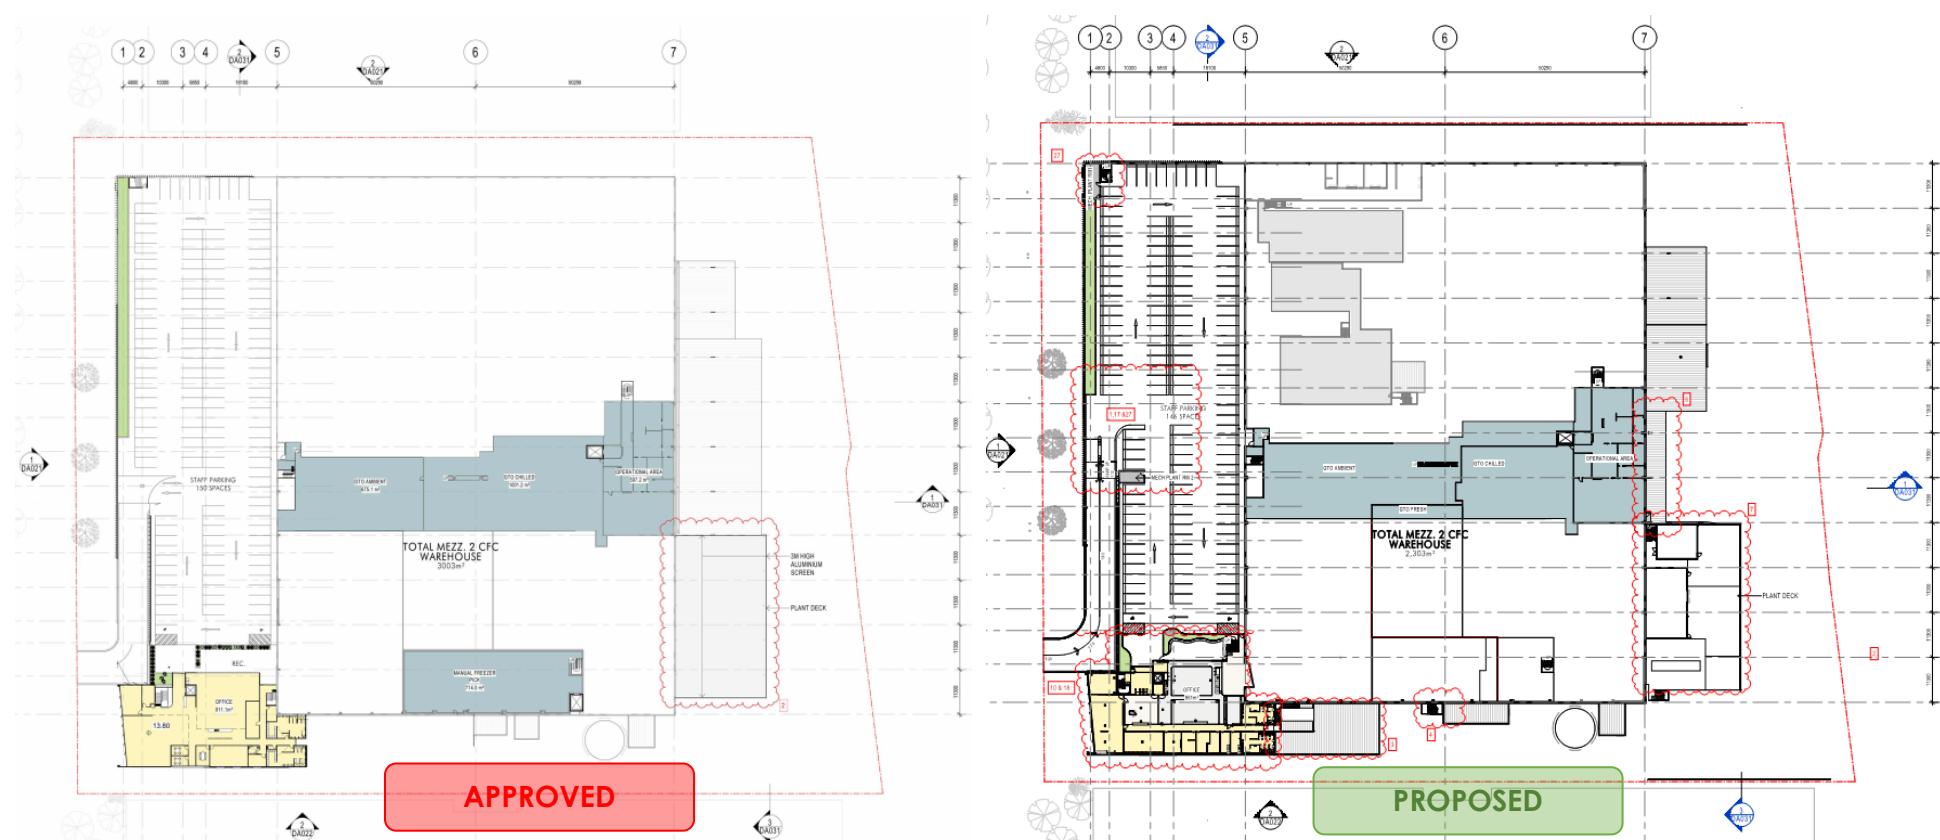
Ground Floor Plan (Source: Nettleton Tribe, 2021)
